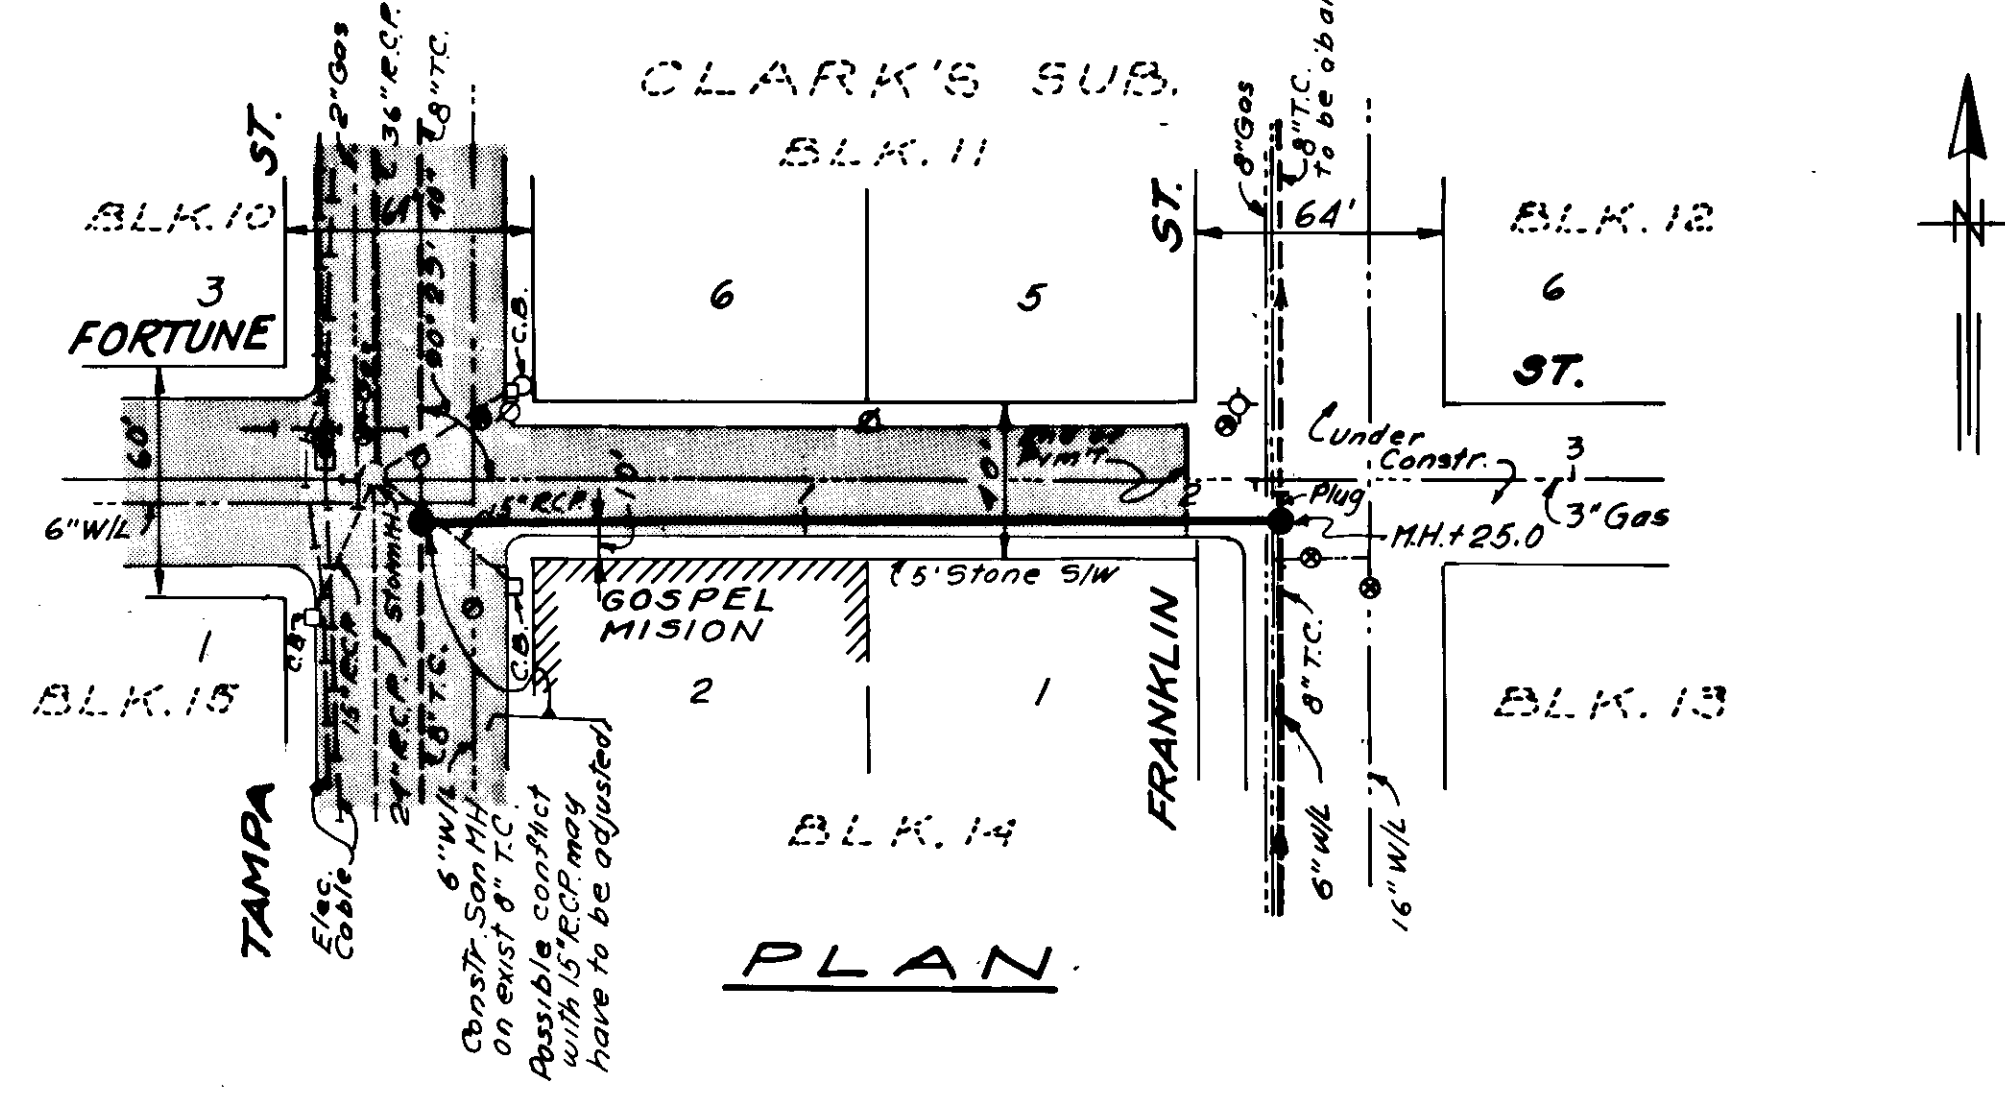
PLAN - PROFILE B.P.R. STANDARD
